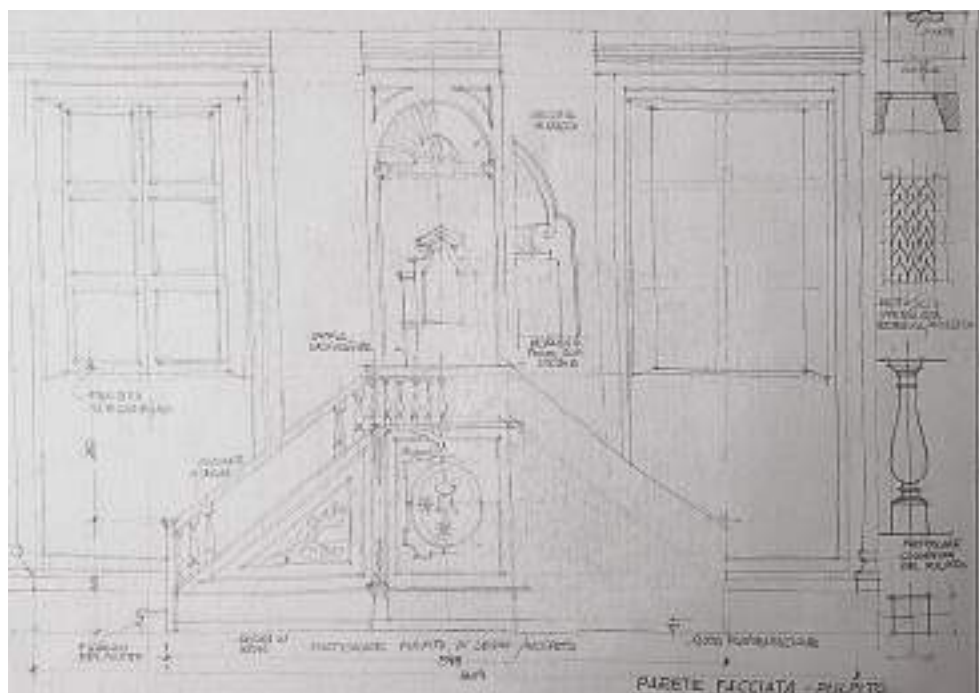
Interior facade, detail of the pulpit. Drawing by E. C.
